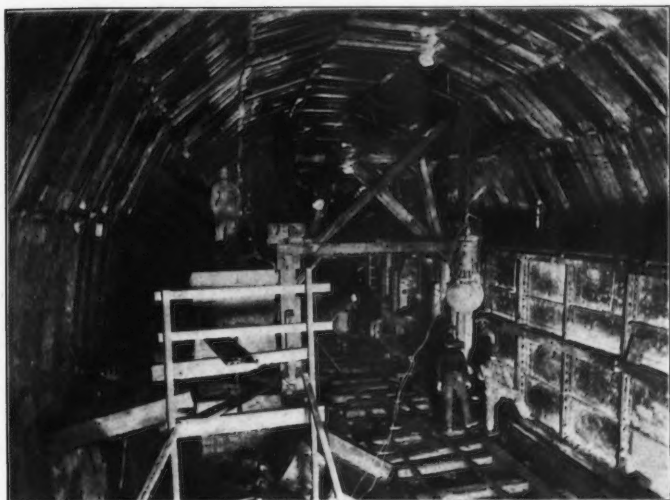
WASHINGTON TERMINAL STATION: TRAVELING DERRICK USED IN CONSTRUCTION OF SIDE- AND CENTER-WALLS.
